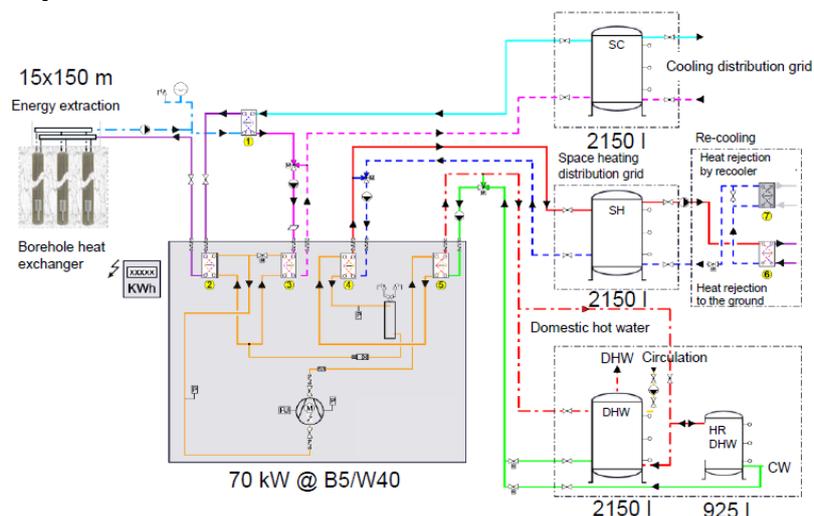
Building technology concept of the building Black & White with mixed commercial and residential use
